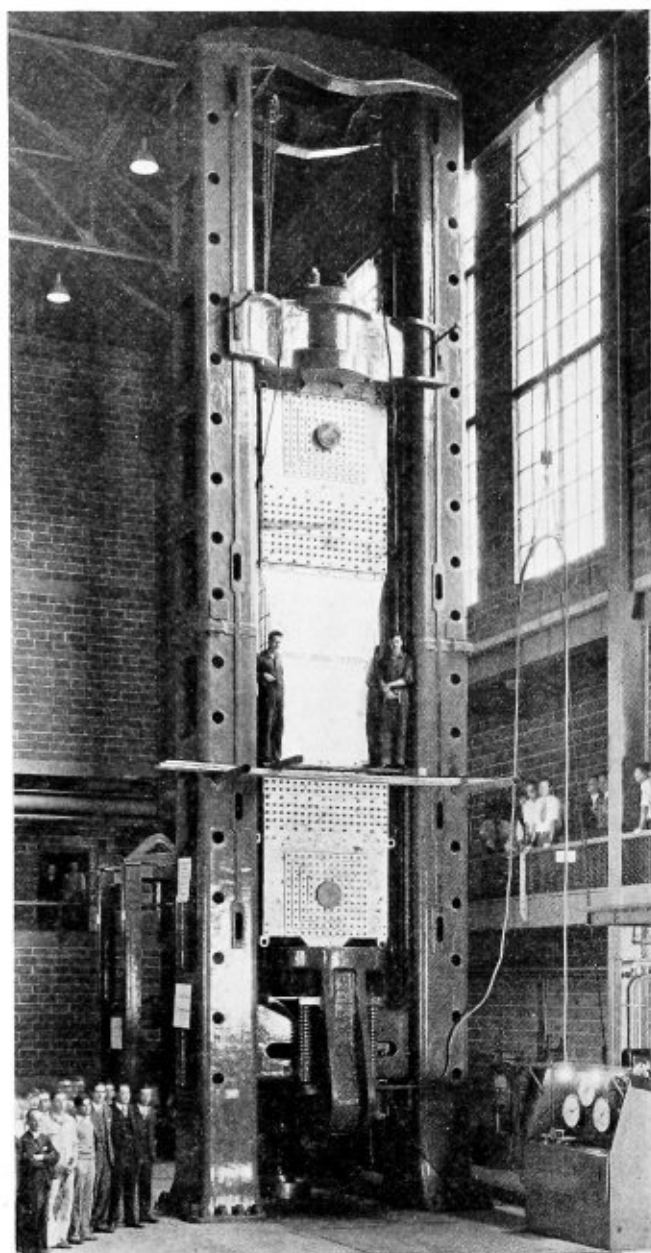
Three-million-pound testing machine with specimen bolted to special pulling heads
